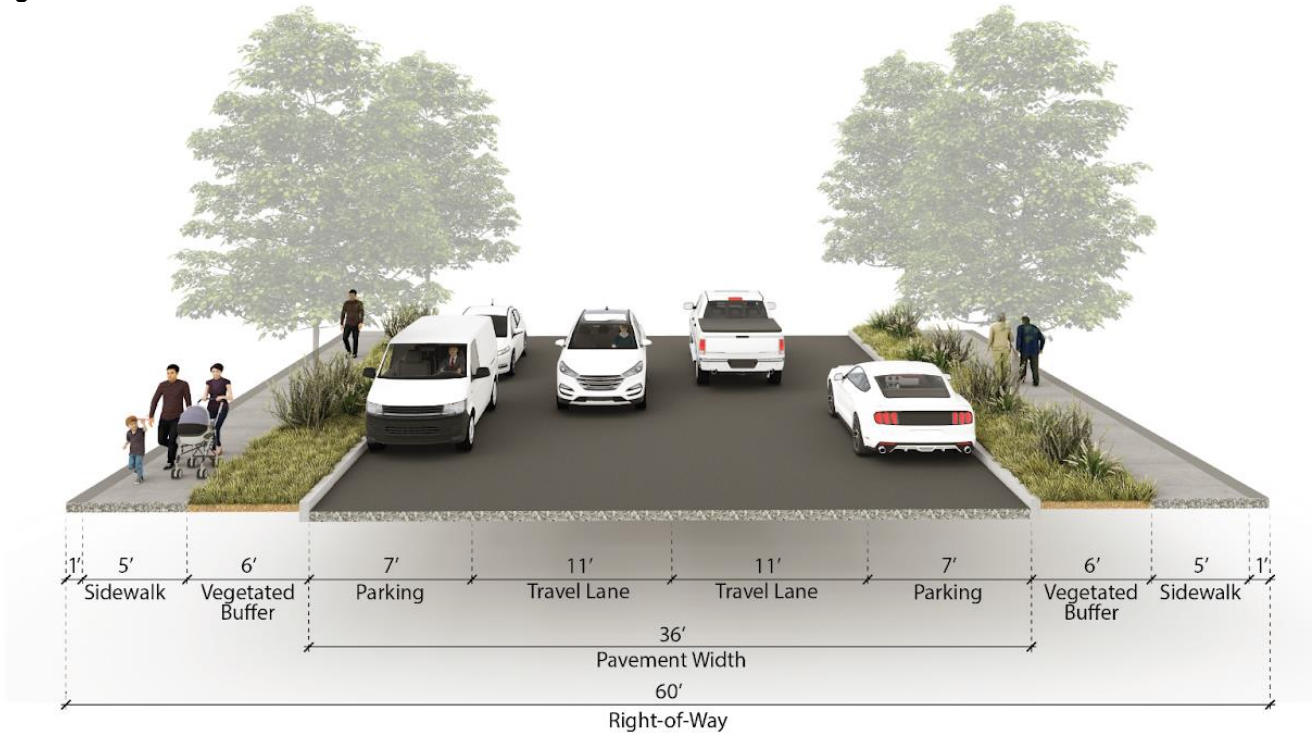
Cross-section for Urban Local Street – Minor Residential Street
